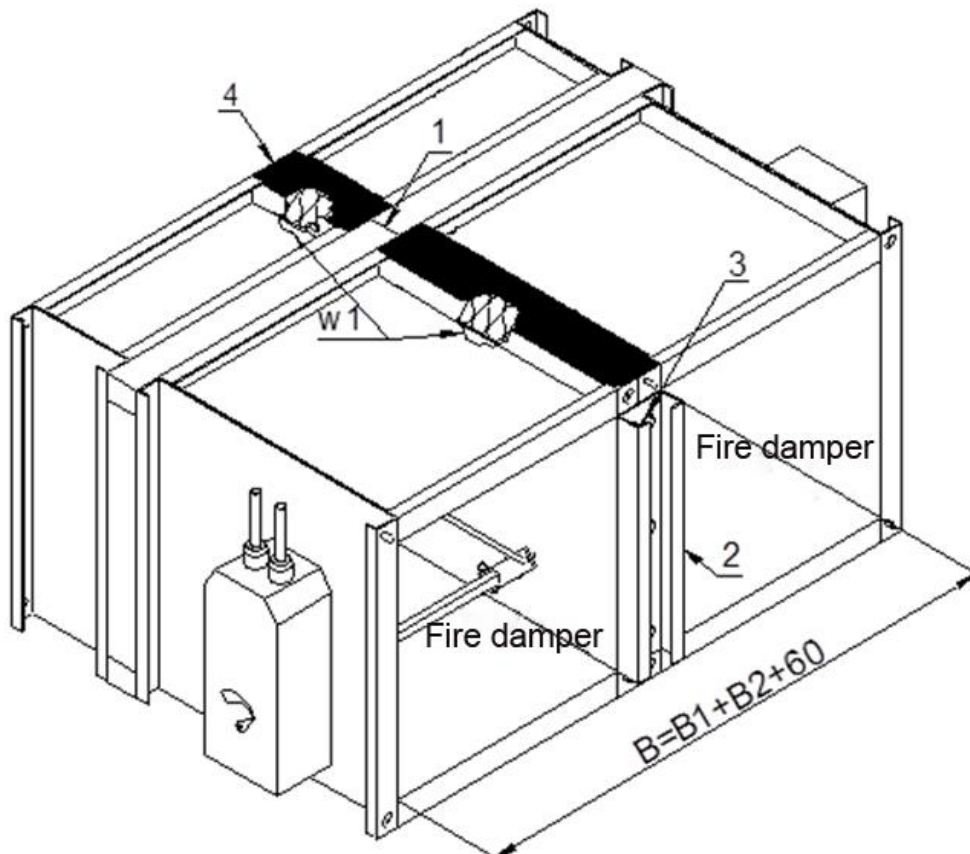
Arrangement 3 - horizontal battery consisting of two fire dampers KWP
